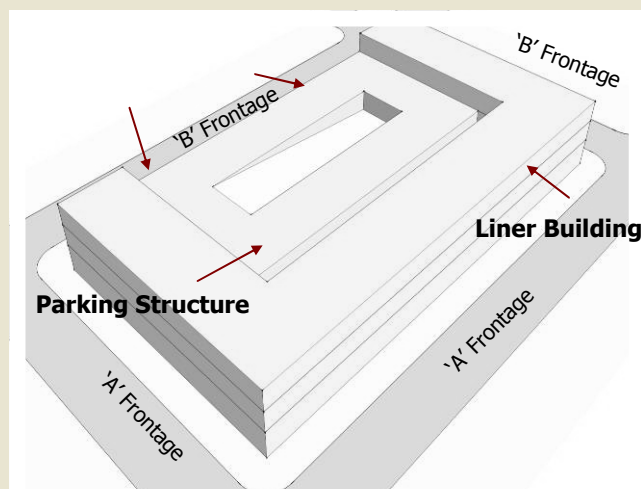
Facades that are articulated with architectural treatment to resemble authentic buildings, and/or more animated approaches are used to mask structured parking (applicable to 'B' Streets).
